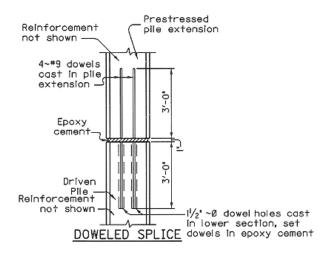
Pile splice detail (courtesy of Kentucky DOT)
